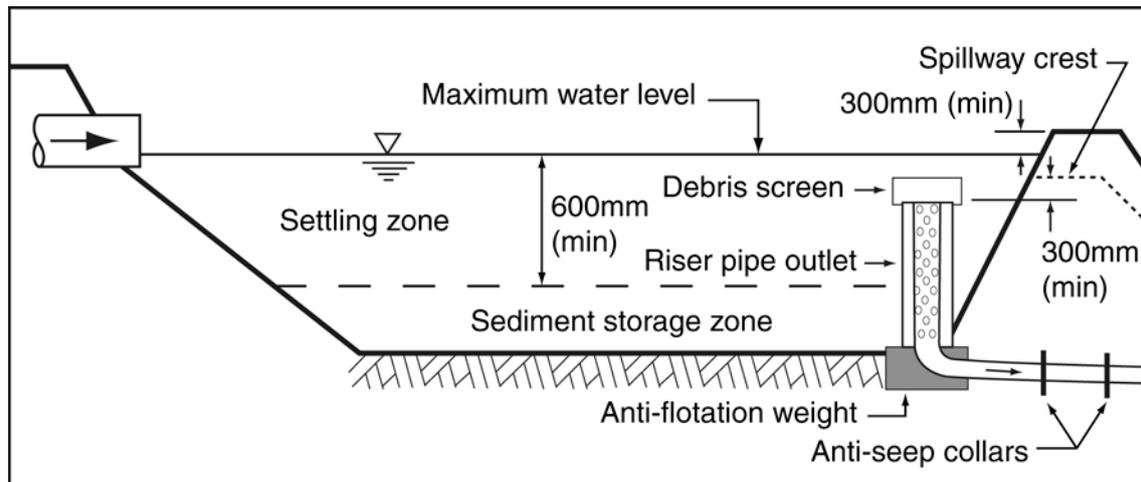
Type C sediment basin with riser pipe outlet (long section)
